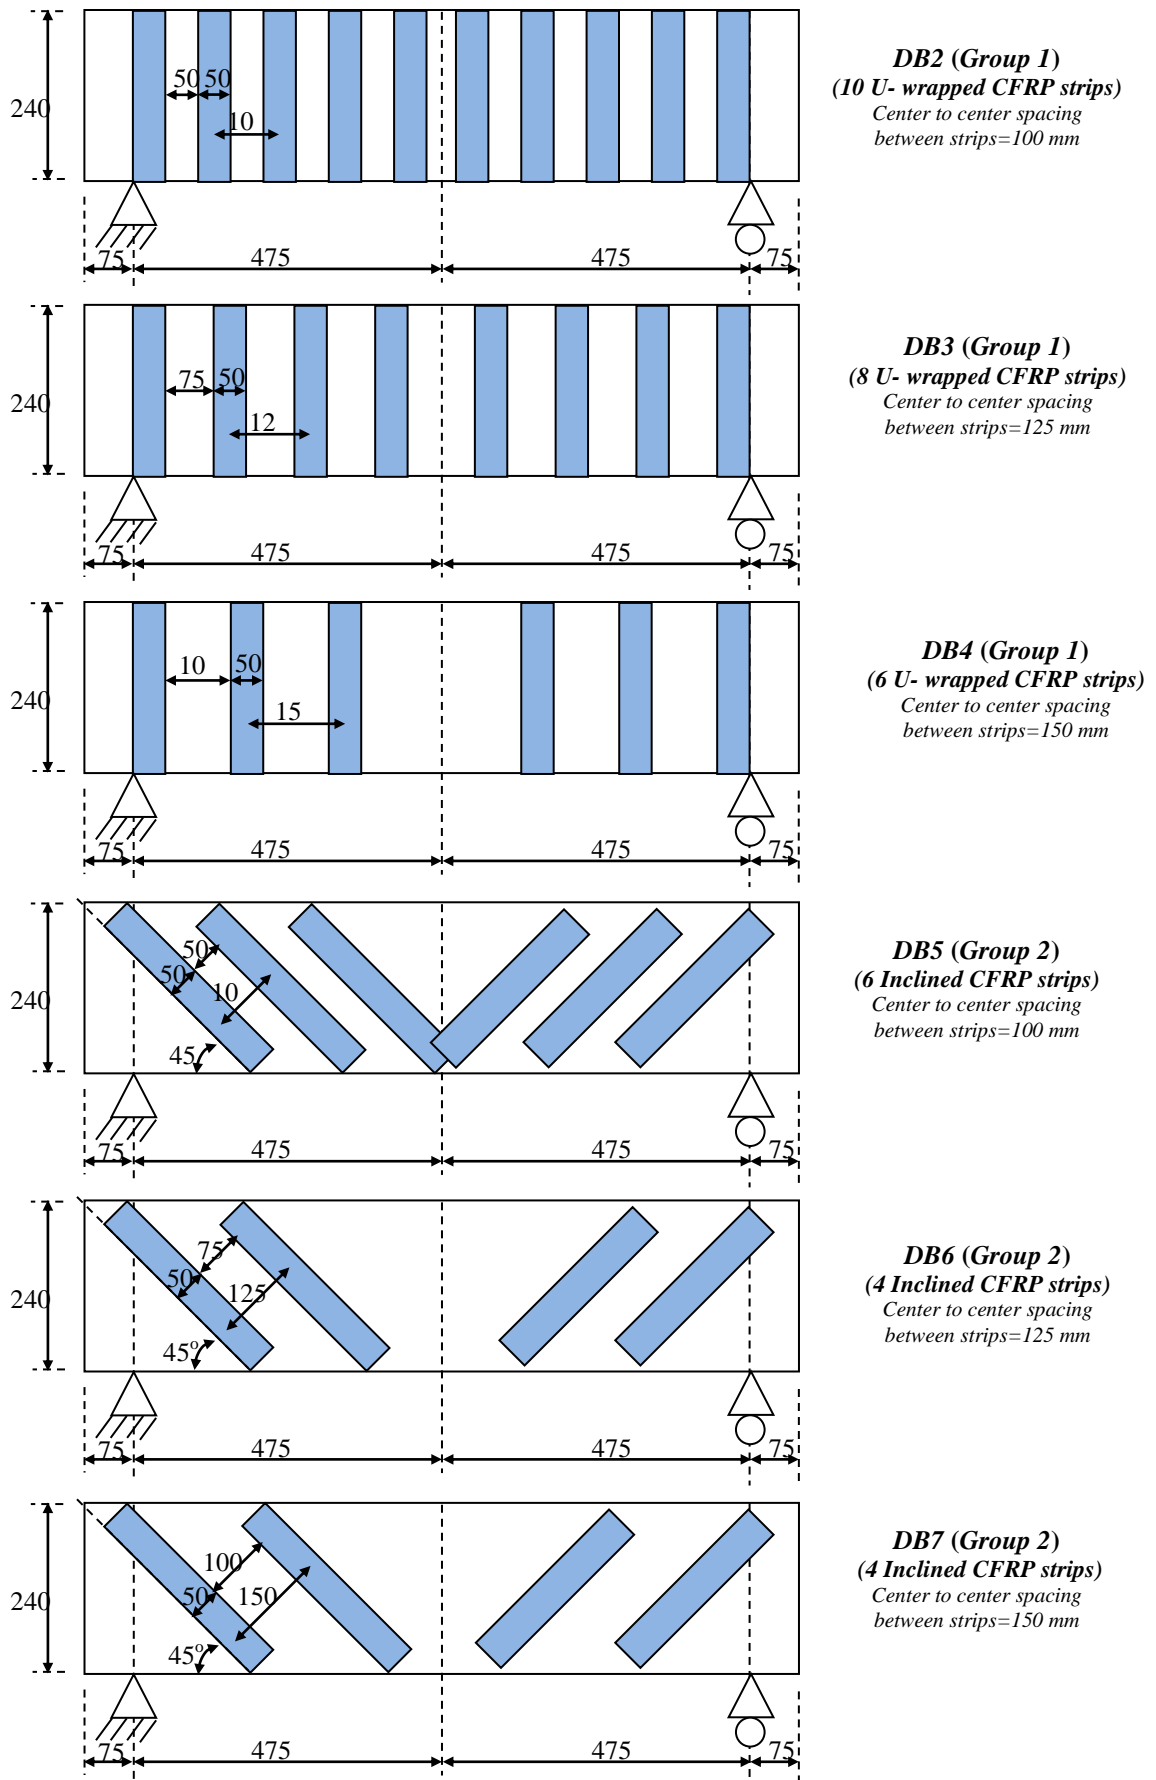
Strengthening schemes and tested beams designations (all dimensions are in mm).
